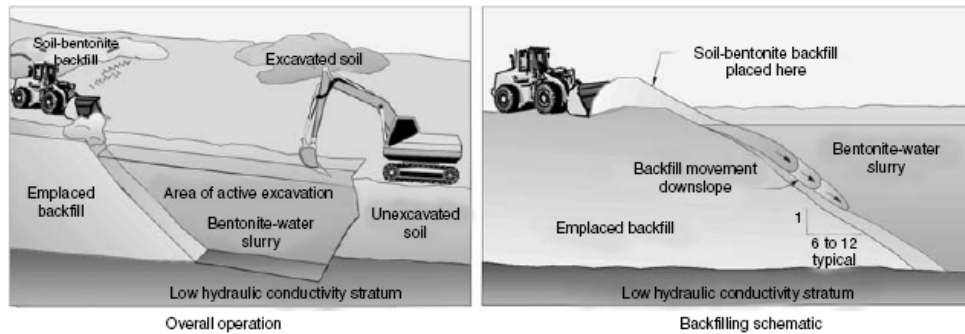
Soil bentonite slurry wall construction. Source: Delleur, (2007).
